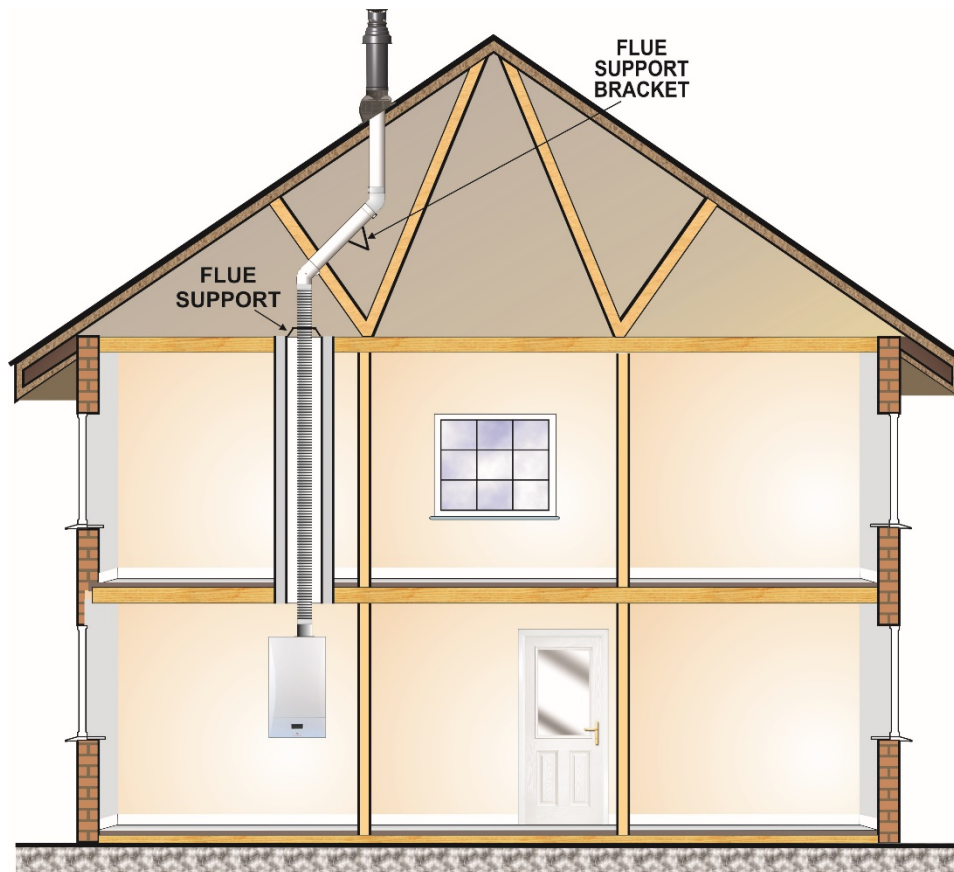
Flexible chimney system from boiler through a void and traditional chimney system in a roof space. Check manufacturer's literature to see if this installation arrangement is approved.
